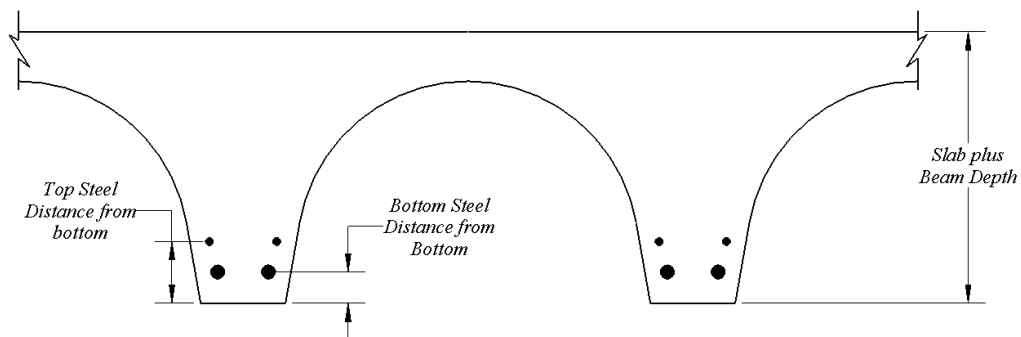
Typical Cross-section of Concrete Pan Girder Bridge (adapted from TxDOT (2001))
